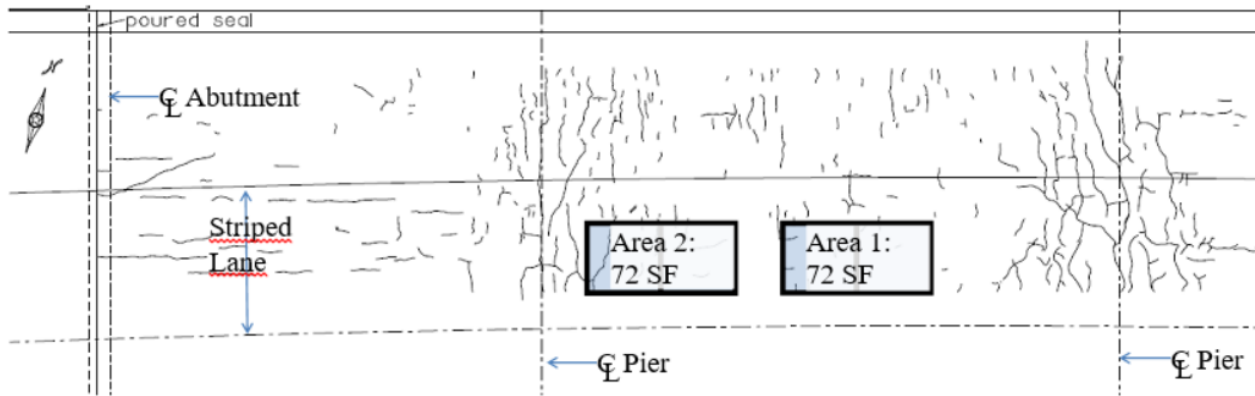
Illustration of crack mapping areas that will be used to characterize general cracking condition of the bridge deck surface.
